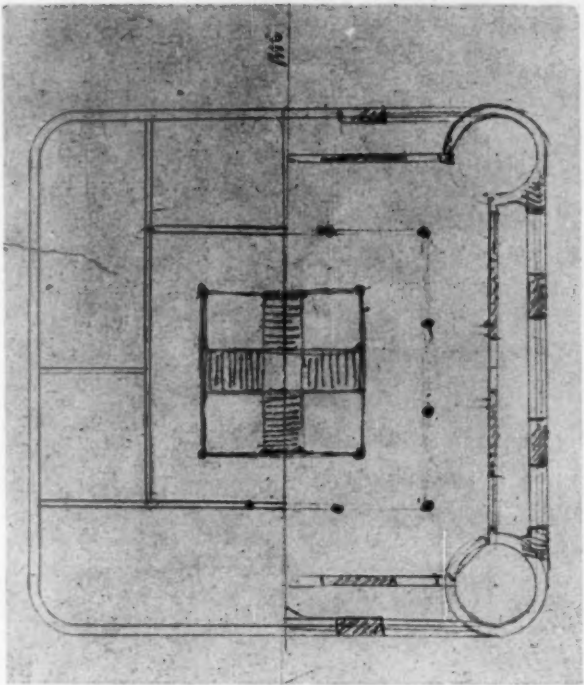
Ground Plan for 28-Story Building, Dated 1886
